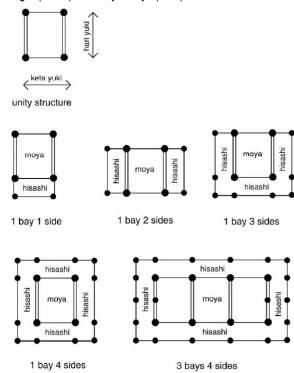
Kenmenkiho: composing the floor plan by repeating the core (moya) and adding verandas (hisashi) around it.
